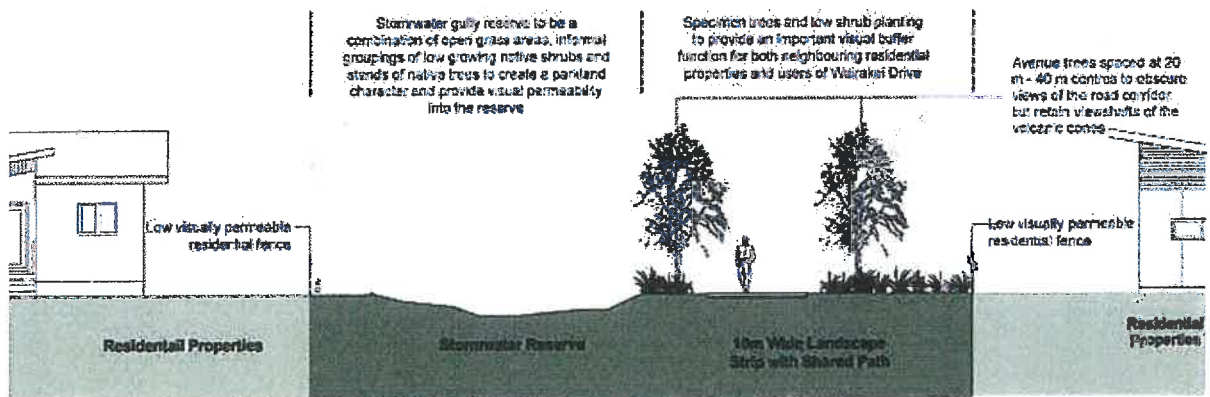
B: Cross section illustrating the Stormwater Reserve frontage
